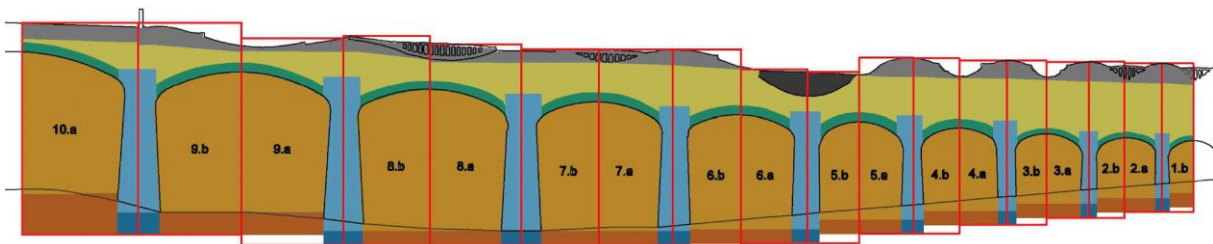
Sections analyzed to assess the stability of the wall of Casa Salvans.
